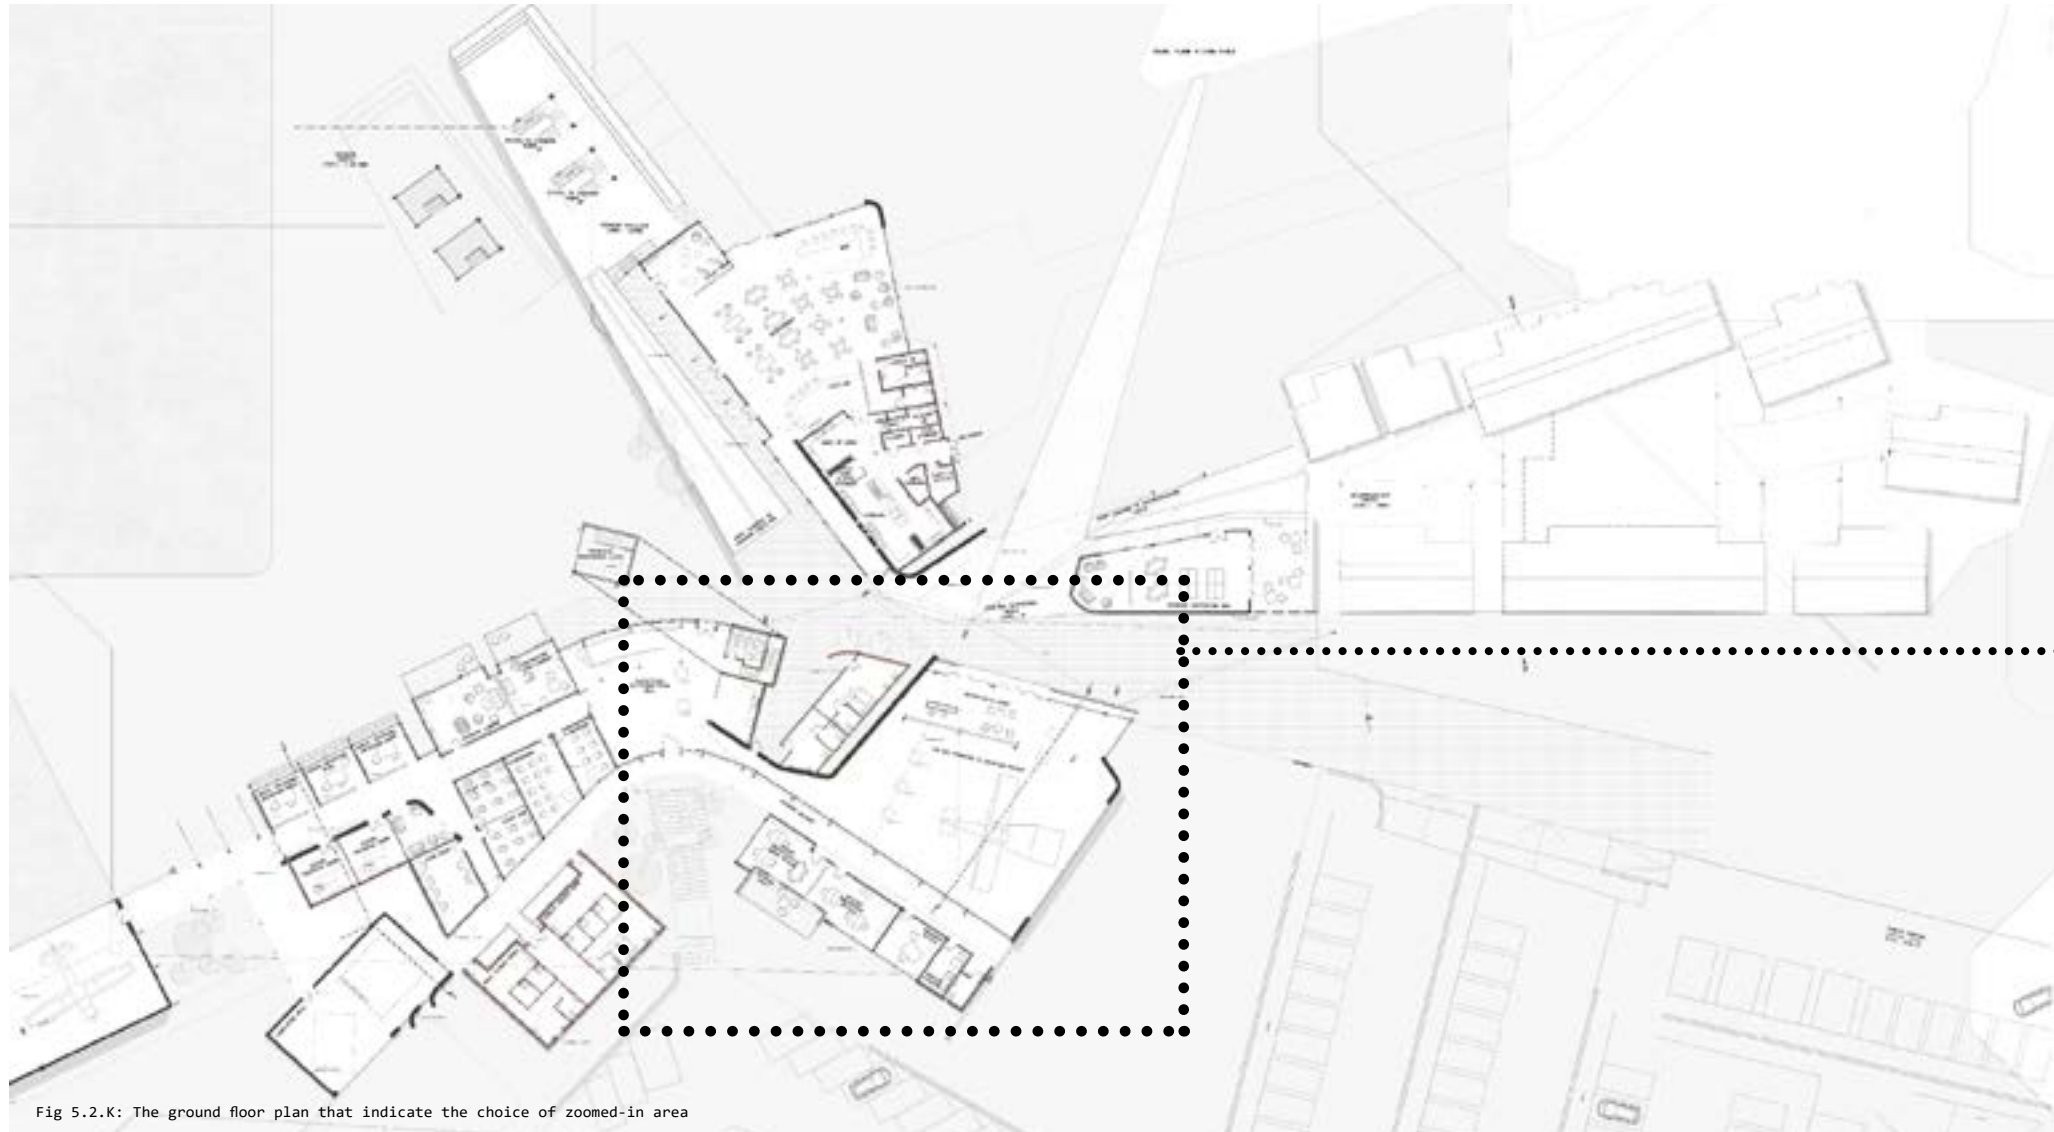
K: The ground floor plan that indicate the choice of zoomed-in area
